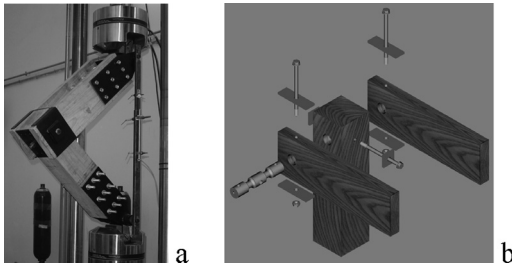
Dissipative beam-to-column wooden connection: (a) experimental tests; (b) component parts of the connection.
